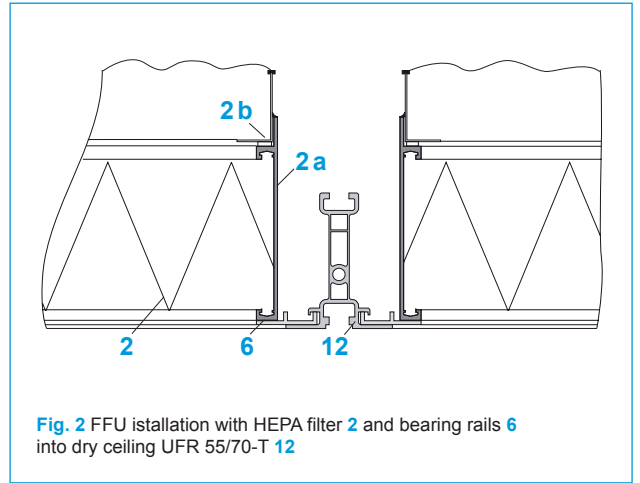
FFU installation with HEPA filter 2 and bearing rails 6 into dry ceiling UFR 55/70-T 12
